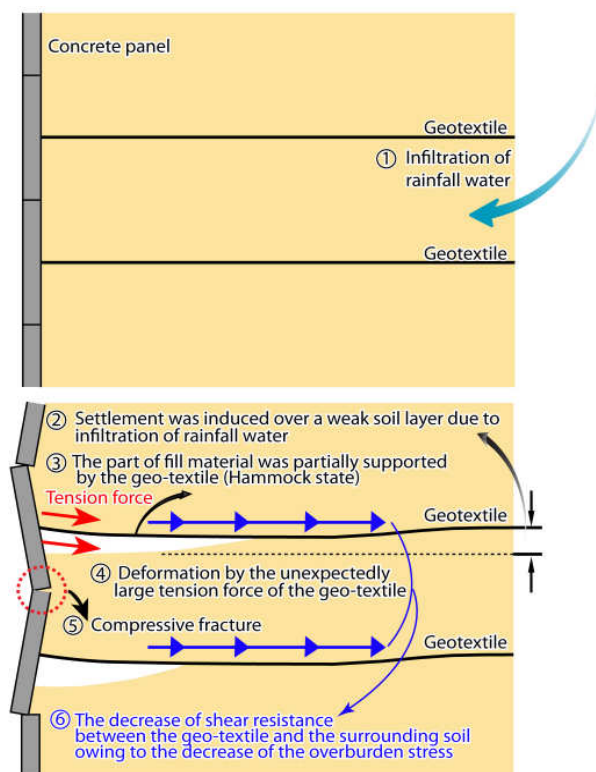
Mechanical behaviour of a largely-deformed reinforced earth wall with geo-textile.
